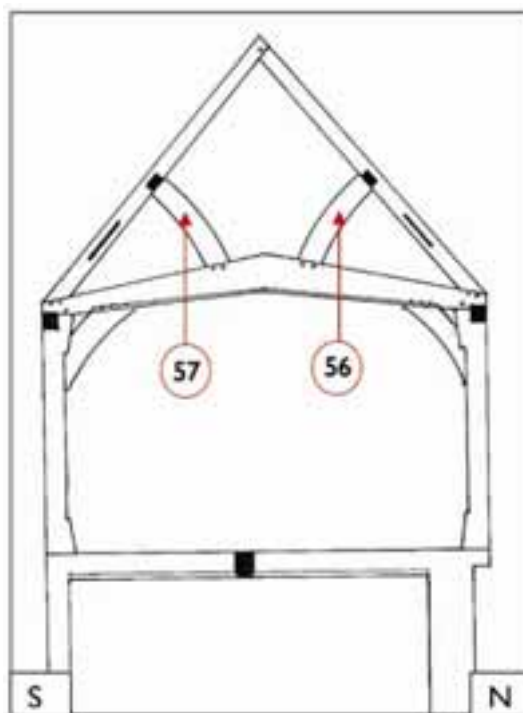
North cross-wing truss 8 showing sample locations, viewed from east looking west (based on drawings provided by N Hill)
